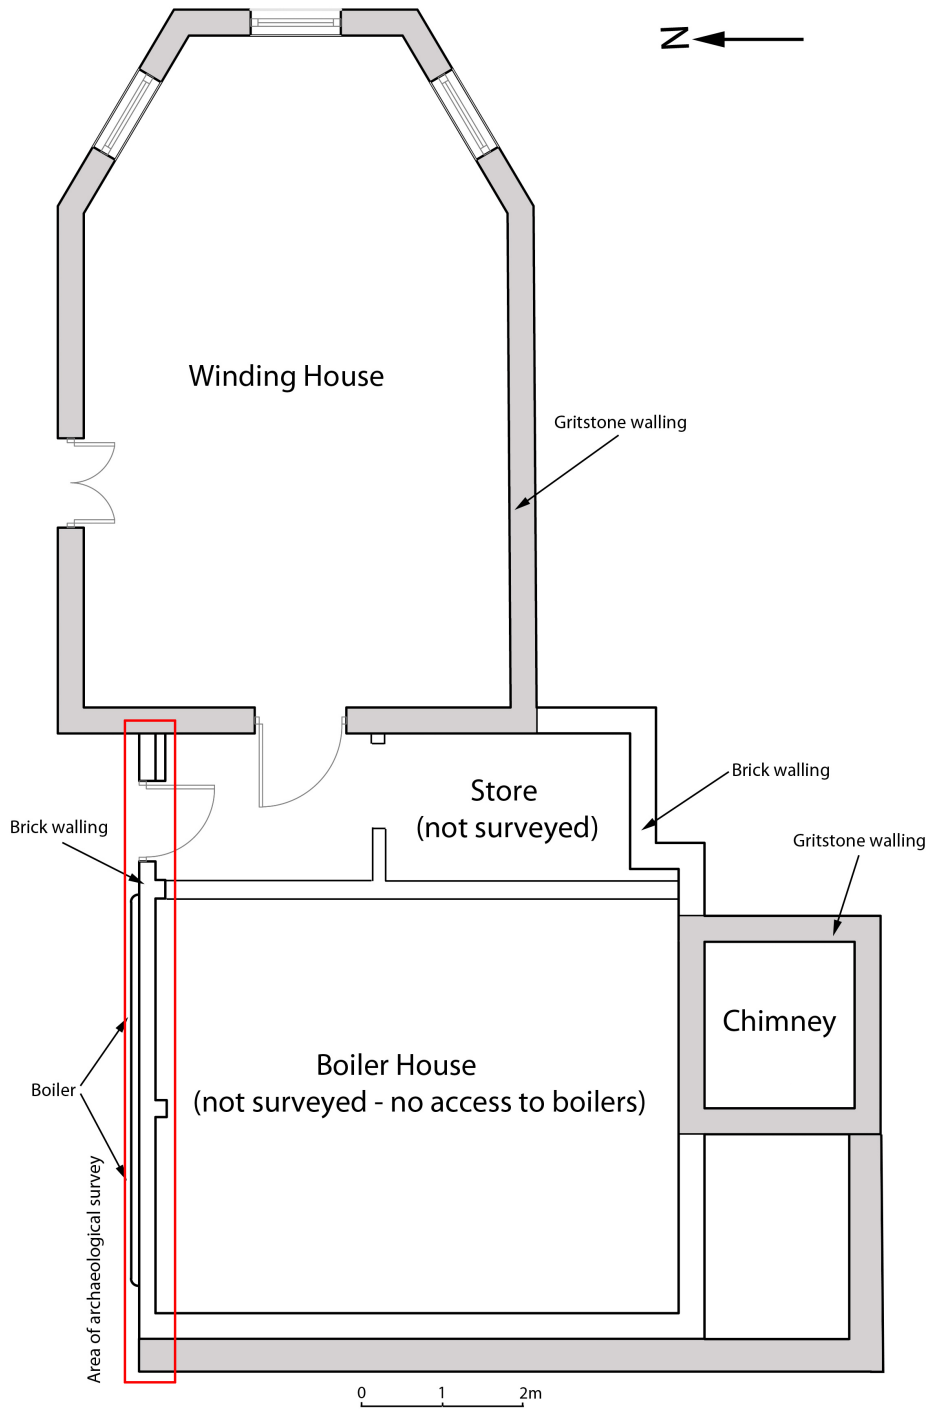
Layout of winding house and boiler house (after DCC 2016)
